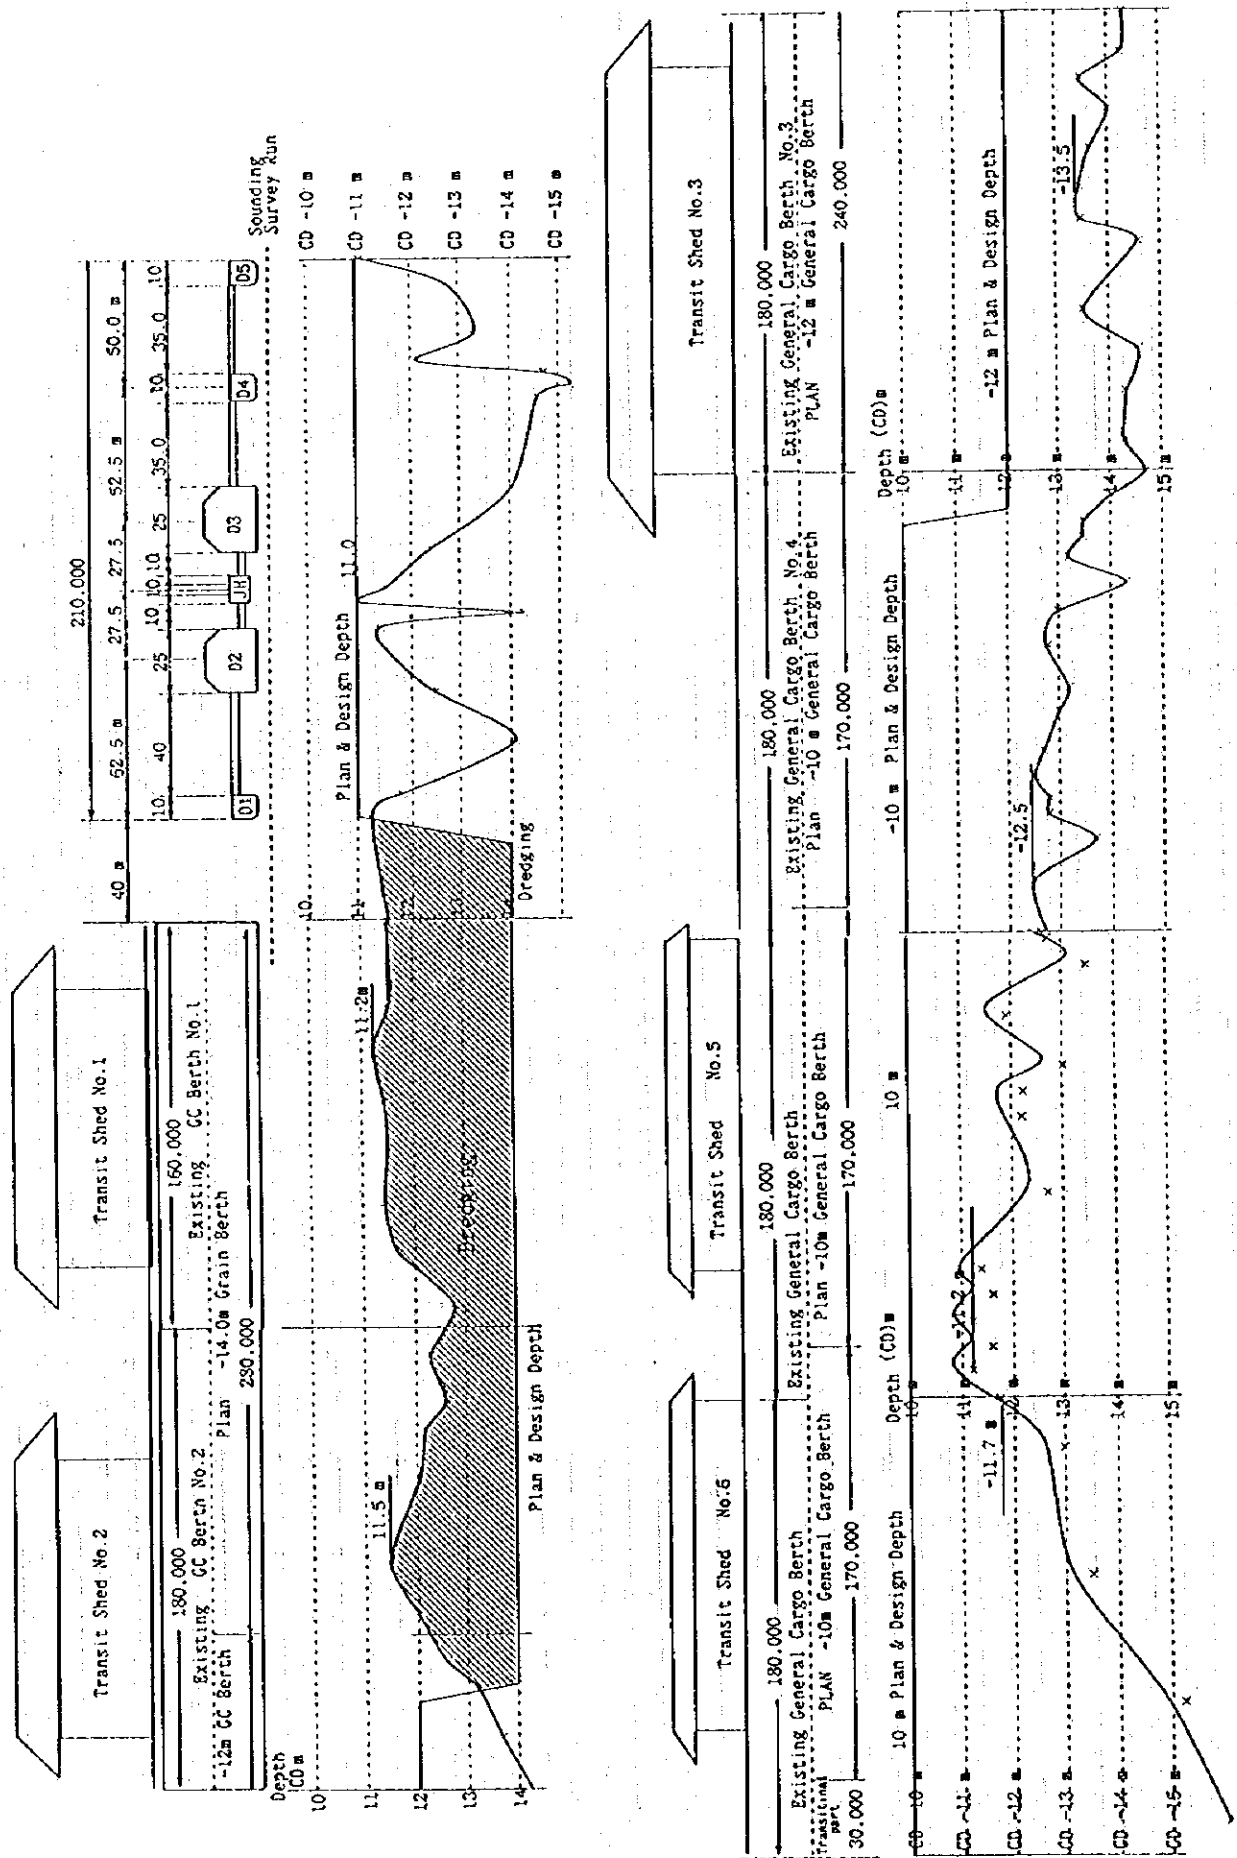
(2) Water Depth and Dredging Plan (Alternative 1)
